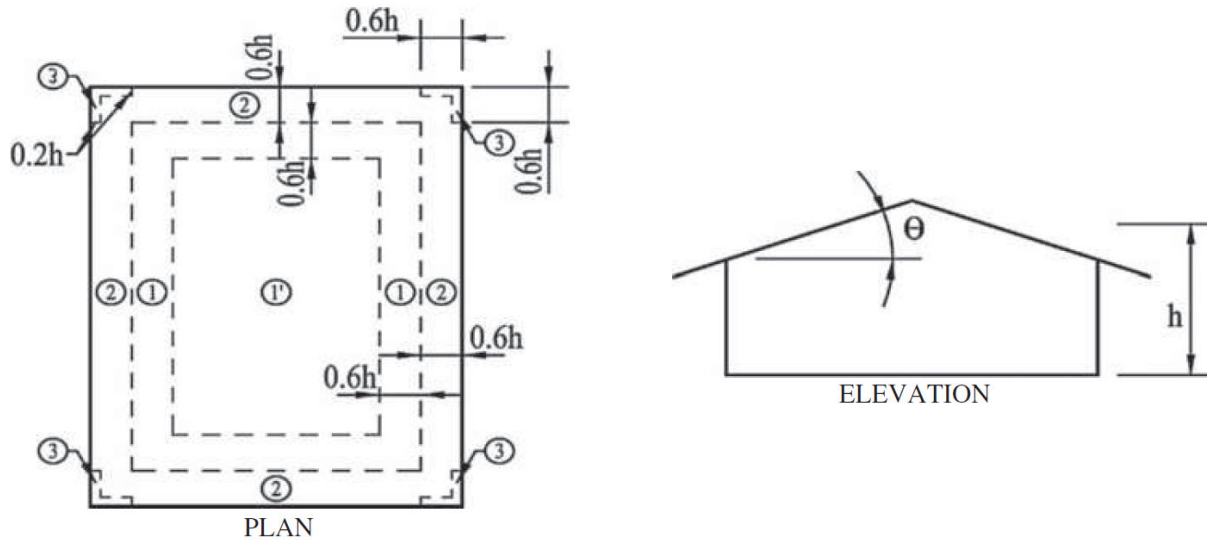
Roof Zones for Gable Roof Slopes Between 0 and 7 degrees
